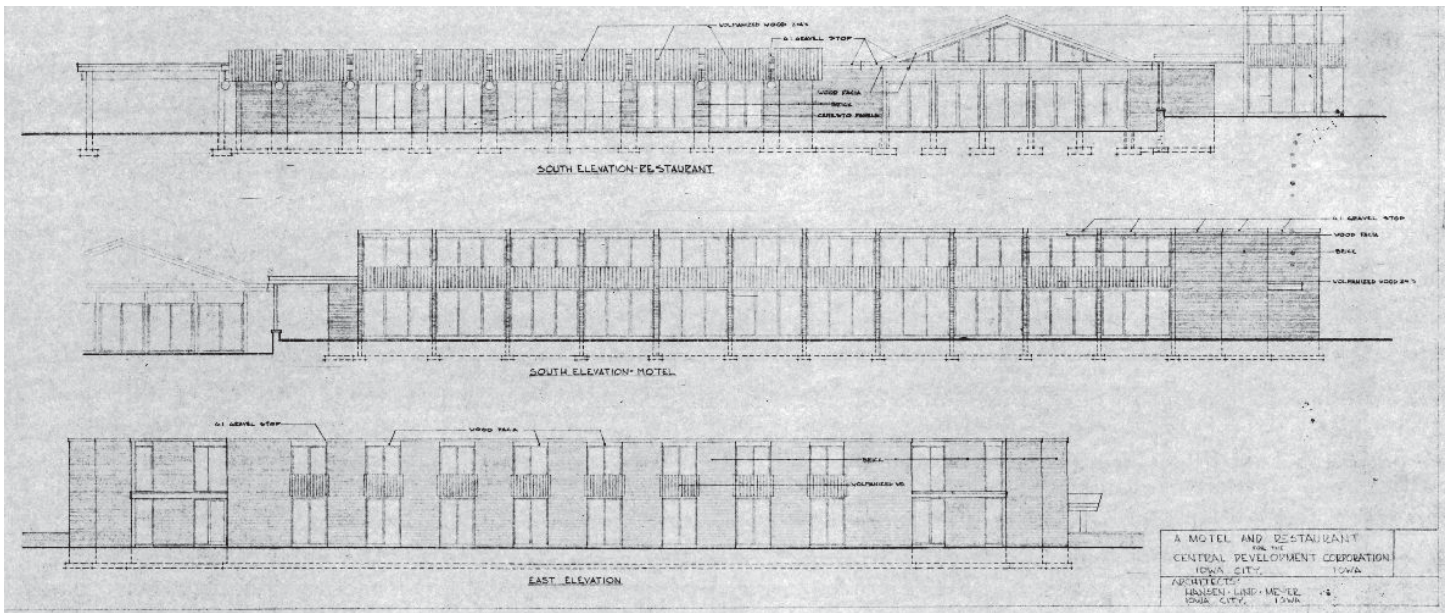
Three elevation views for “Motel and Restaurant” (Hansen, Lind and Meyer, Architects)
